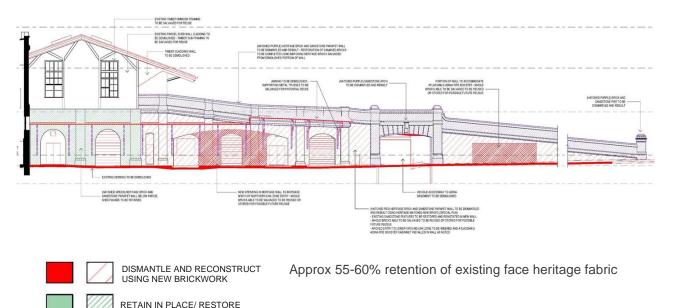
Proposed Dismantling Methodology for the Ambulance Avenue Heritage Wall
